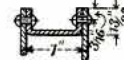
DETAIL SHOWING FIXING OF DISTANCE PIECES
